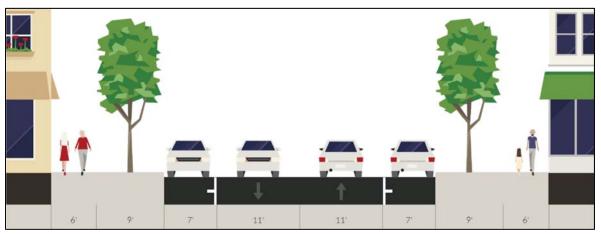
Ashley Street Typical Cross Section, north of William Street – Proposed Design
